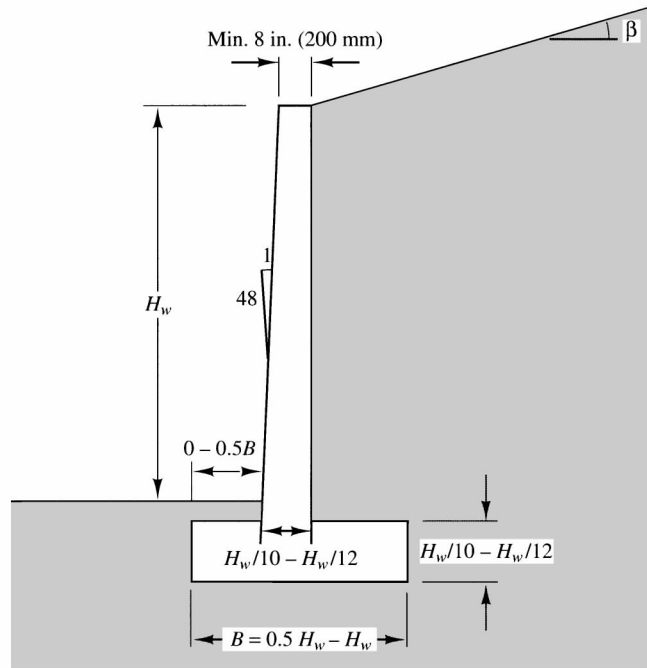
Suggested first trial dimensions for cantilever retaining walls back-filled with sandy soils. For short walls with strong soils and level backfill, the toe extension will be about $0.5B$. For weaker soils or inclined backfill, the toe extension will be less (with a corresponding increase in the heel extension).
